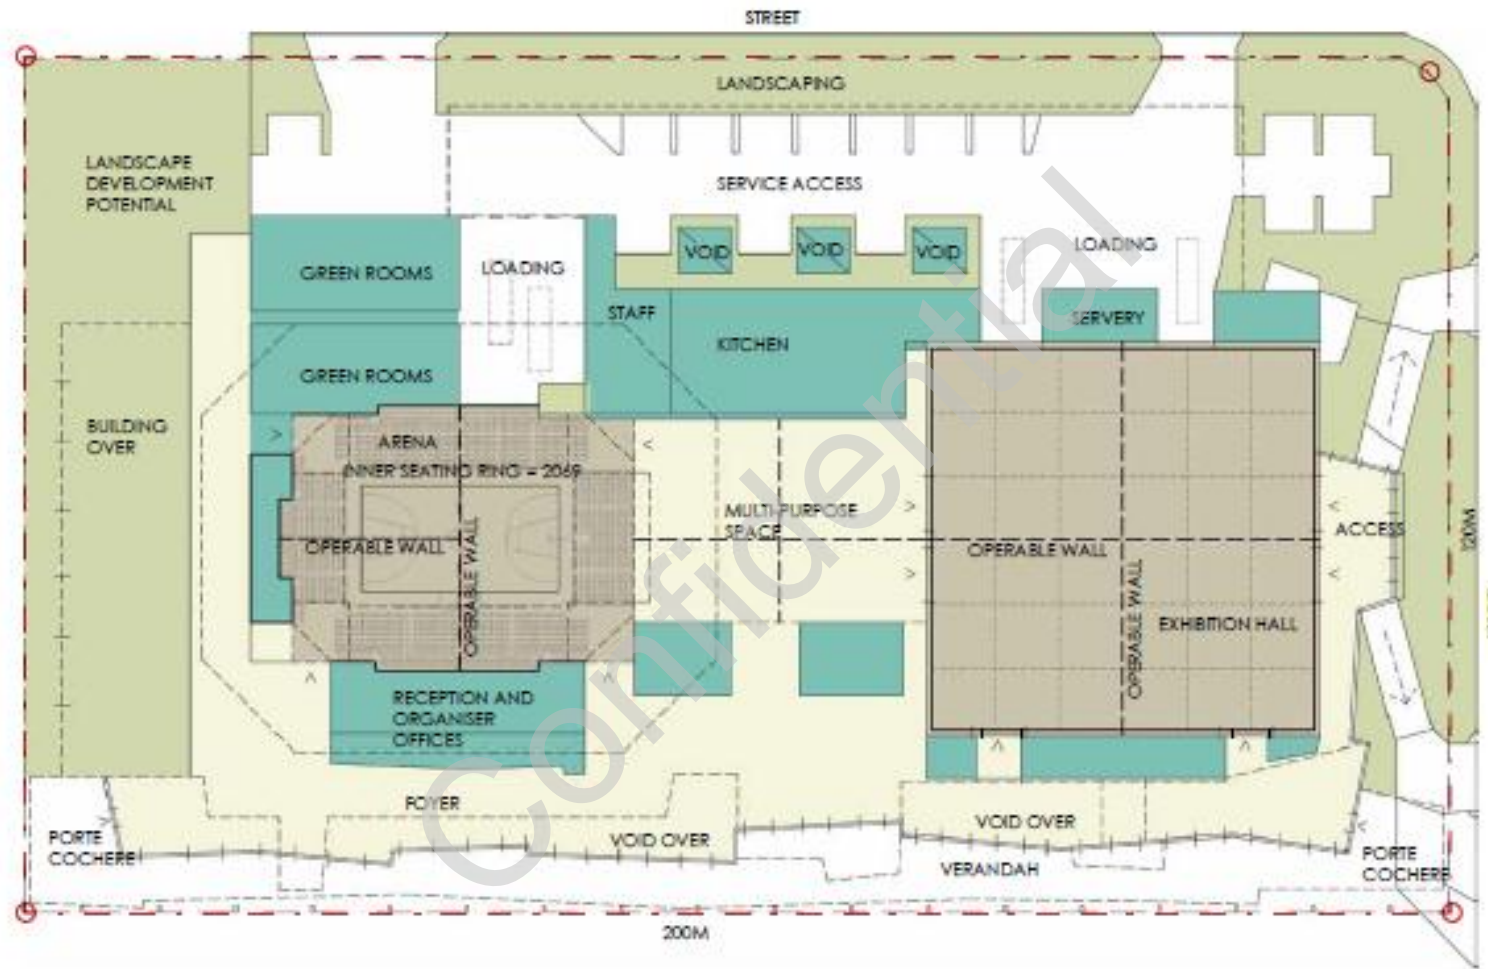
Indicative Concept Drawing - Ground Floor Level Plan
